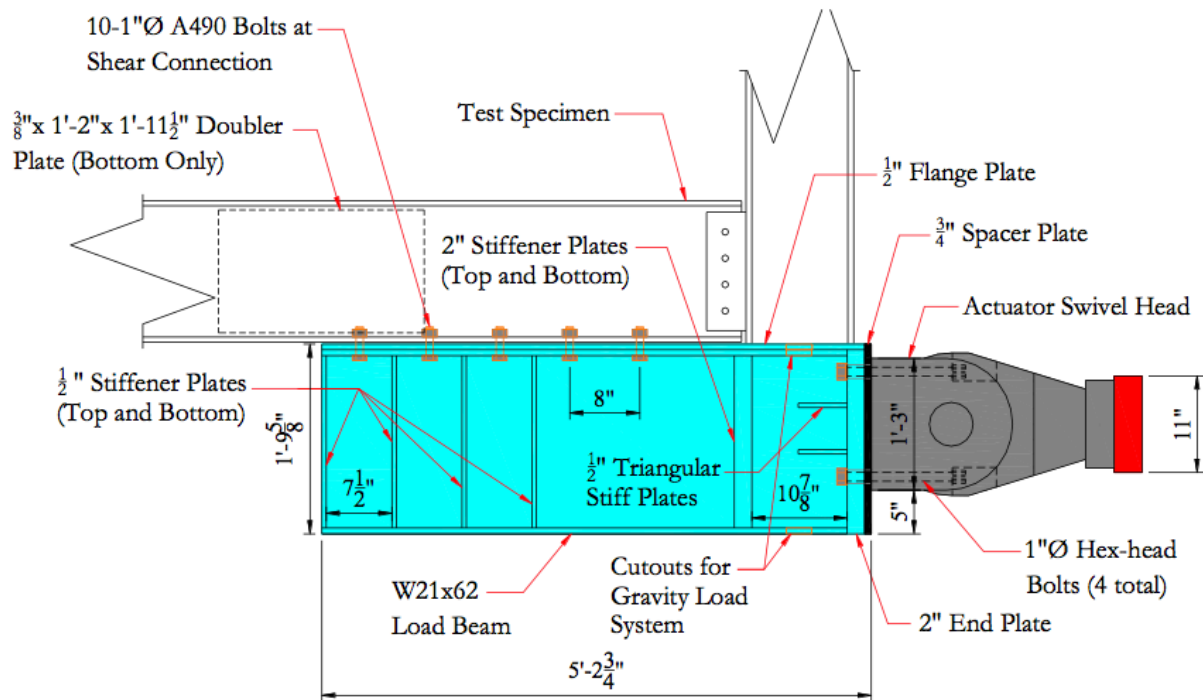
Load Transfer Beam Layout [Powell, 2010]
